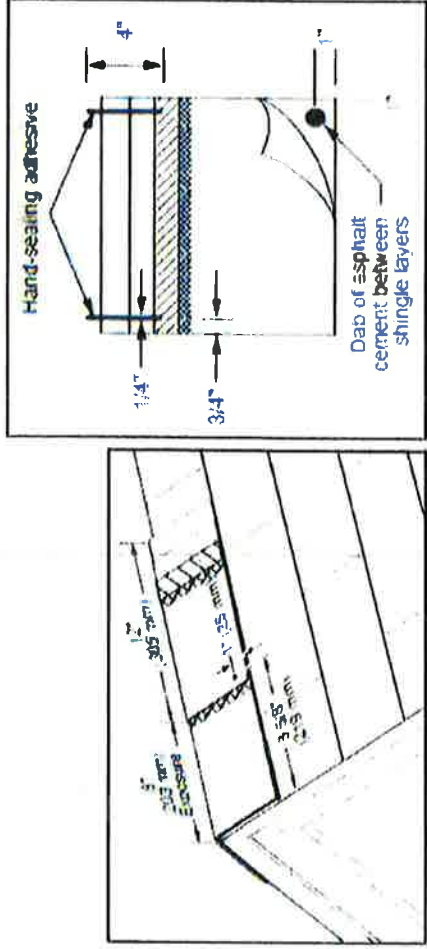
Use six nails and two tabs of asphalt roofing cement on steep slopes.
